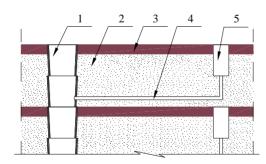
New dewatering facilities in stope 1—drainage tower 2—filling body 3— hard floor 4—drainage pipe 5—dewatering cage
